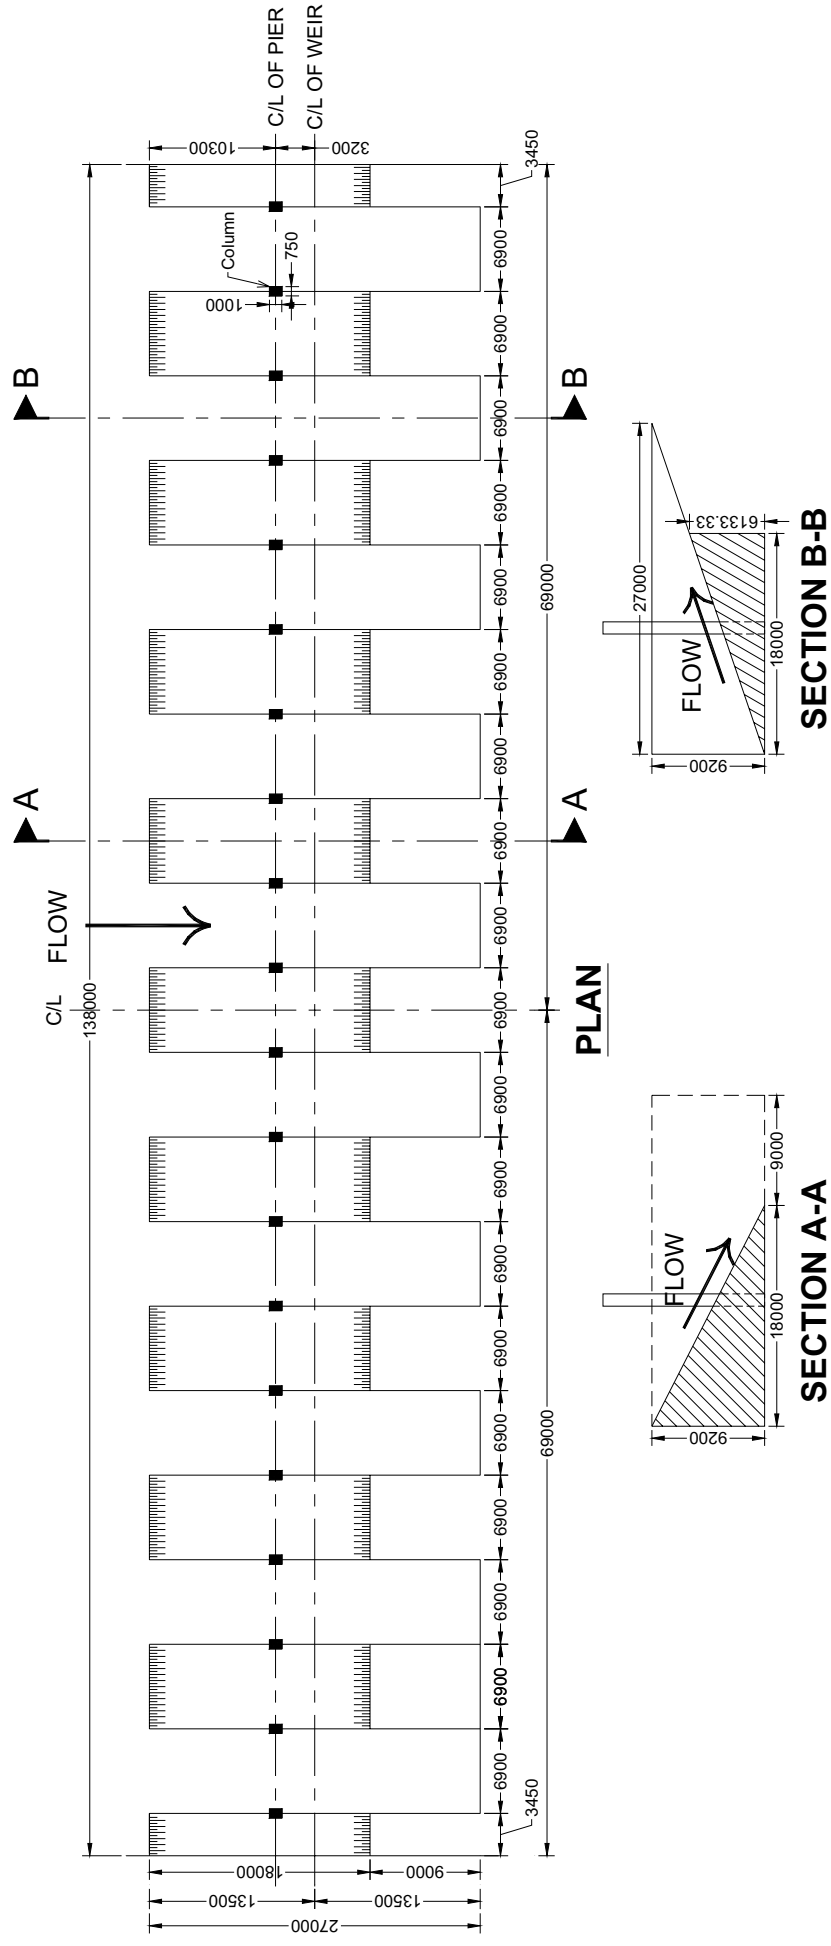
Plan and section of model C_1M_6 for prototype (dimensions in mm)
